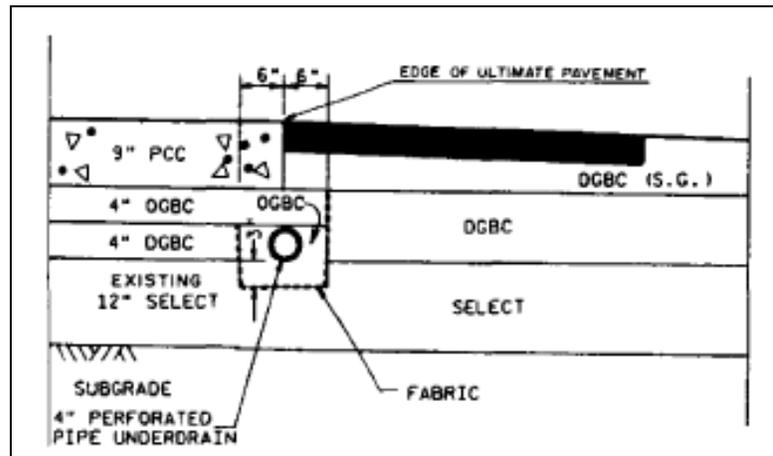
USH 18/151 Sections 1 and 2 with Non-Stabilized OGBC
